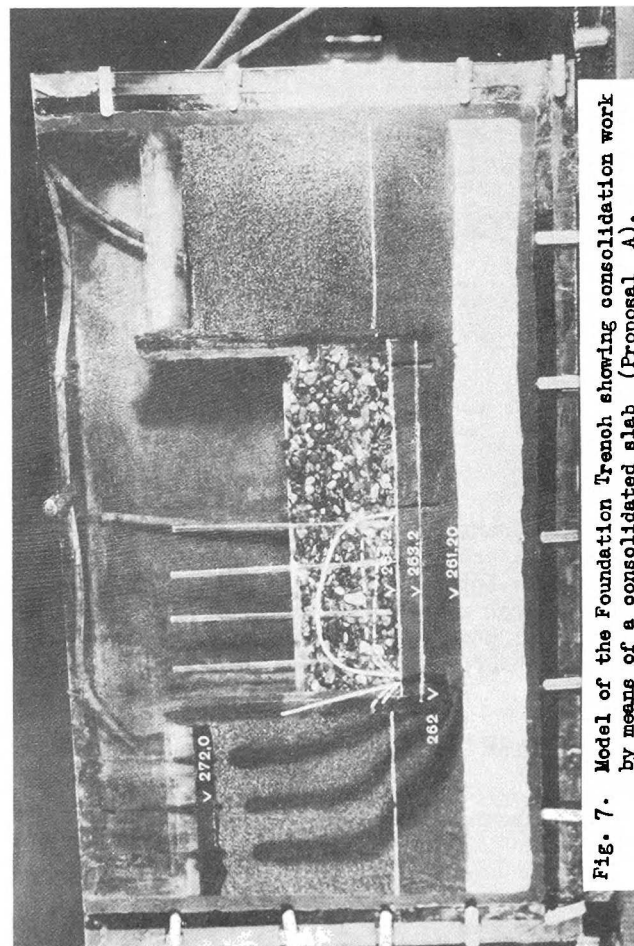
Model of the Foundation Trench showing consolidation work by means of a consolidated slab (Proposal A).
